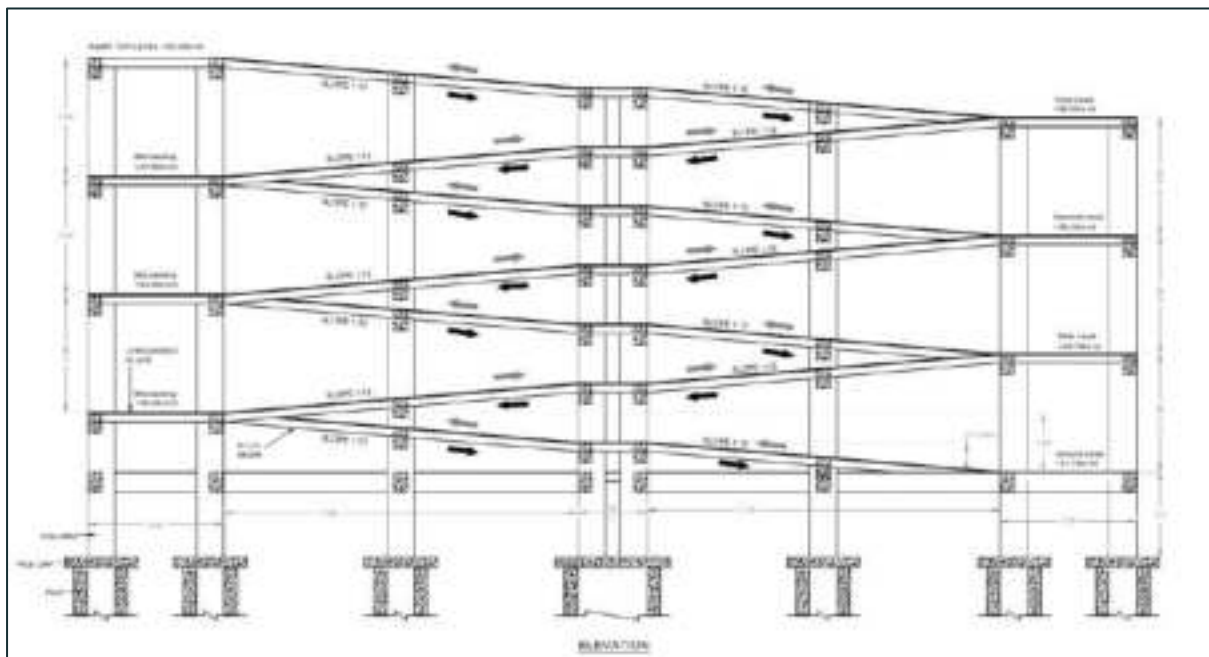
Option-1 Sectional Elevation of Ramp Structure
